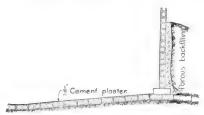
Number One Type of Foundation. Constructed entirely of Building Blocks.
